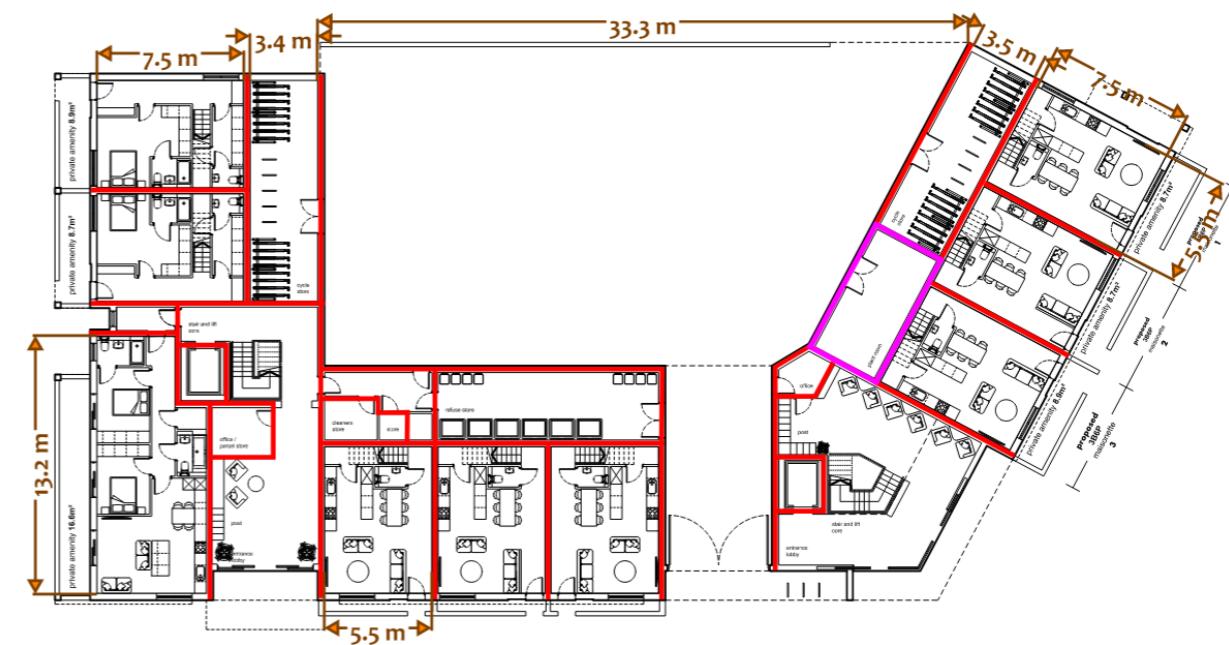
Compartment dimensions in Block 2 at Ground Floor
